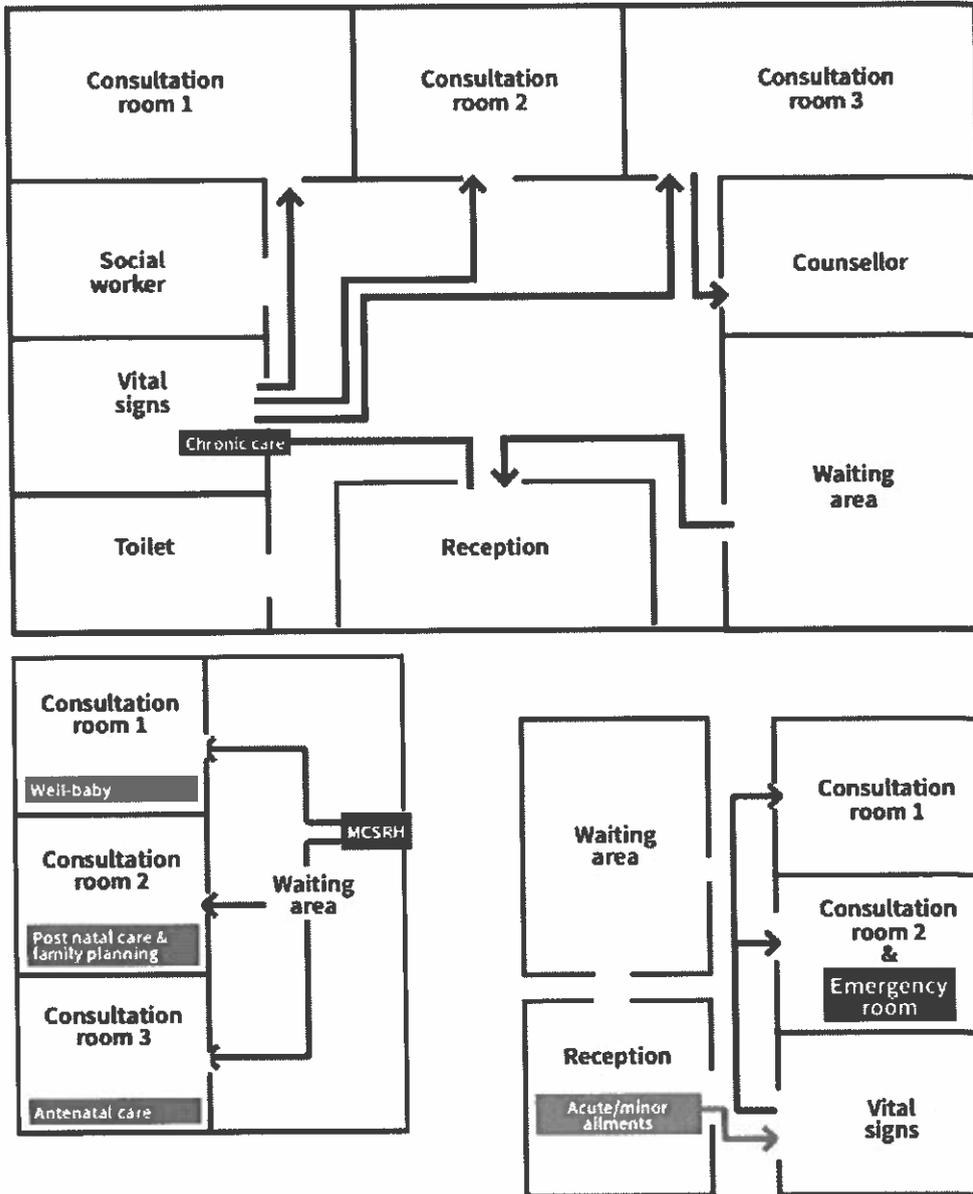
SKETCH PLAN FOR A MULTIPLE BUILDING FACILITY
